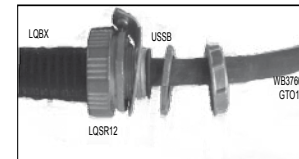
Slide locknut and metallic end bushing over WB3760 and GTO cable and screw all pieces together
